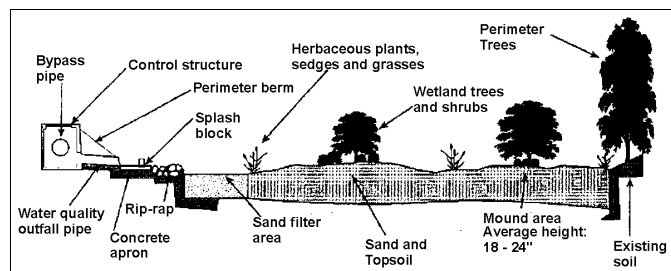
Bioretention cross-section. Runoff from storms greater than 1-year storm is bypassed through main drainage system. Runoff from small storms is diverted at the control structure (manhole). Stormwater energy is dissipated by the splash block or rip-rap. Stormwater is filtered through an open sand filter. Excess stormwater is treated in the bioretention area (CH2M Hill, 1998).
